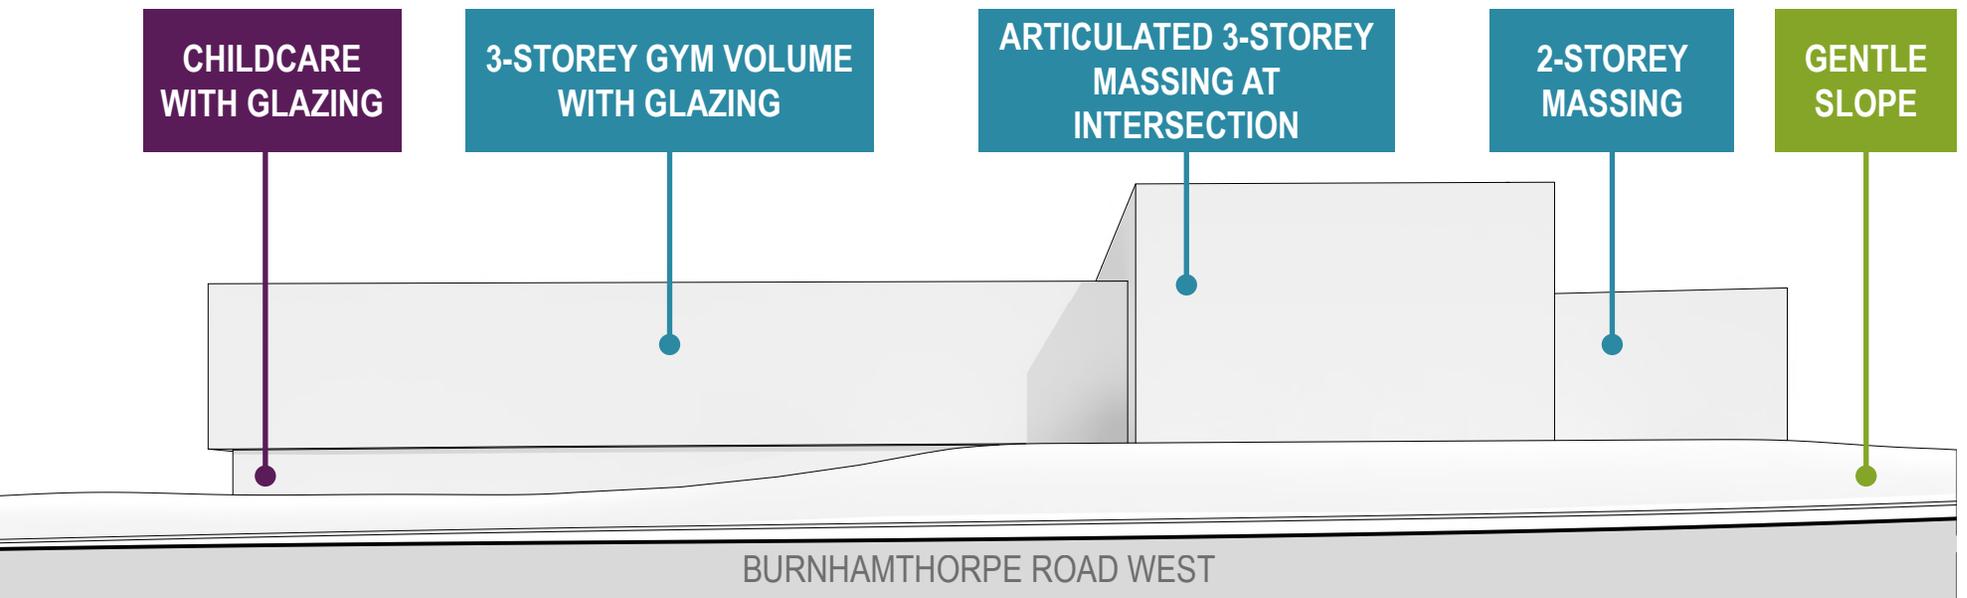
Massing elevation of the proposed school along Burnhamthorpe Road West
